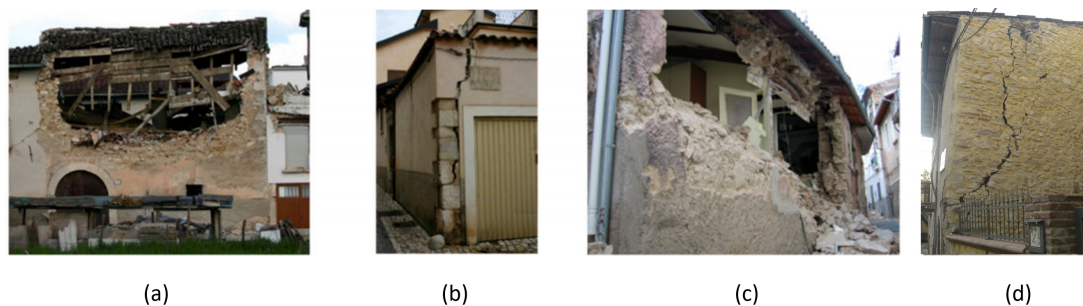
Examples of out-of-plane damage patterns from L'Aquila 2009 earthquake: (a) Out-of-plane mechanism in long walls. (b) Global overturning of external walls. (c) Overturning due to the lack of anchorage between walls and horizontal diaphragms. (d) Corner out-of-plane mechanism Ortega et al. (2018). (Sources: Dr. Javier Ortega, Prof. Hugo Rodrigues)
